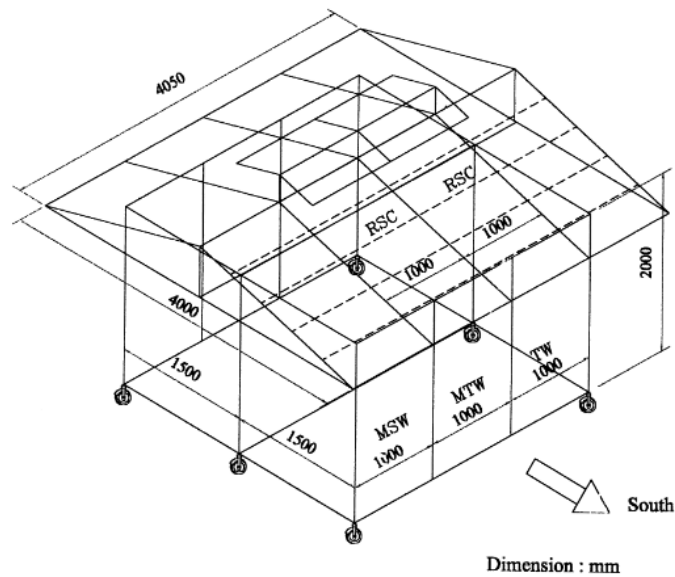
Schematics of solar chimneys installed in the single-room solar house [44] Solar chimneys integrated into the southern wall of a single-room school solar house, with a volume of about 25 m³, serve a dual purpose. They act as excellent insulation materials to reduce solar heat absorption and promote natural ventilation, enhancing thermal comfort. However, they provide an average of 1.6 to 2.5 air changes per hour (ACH) between 12 PM and 2 PM, which may not fully meet occupant ventilation needs,
